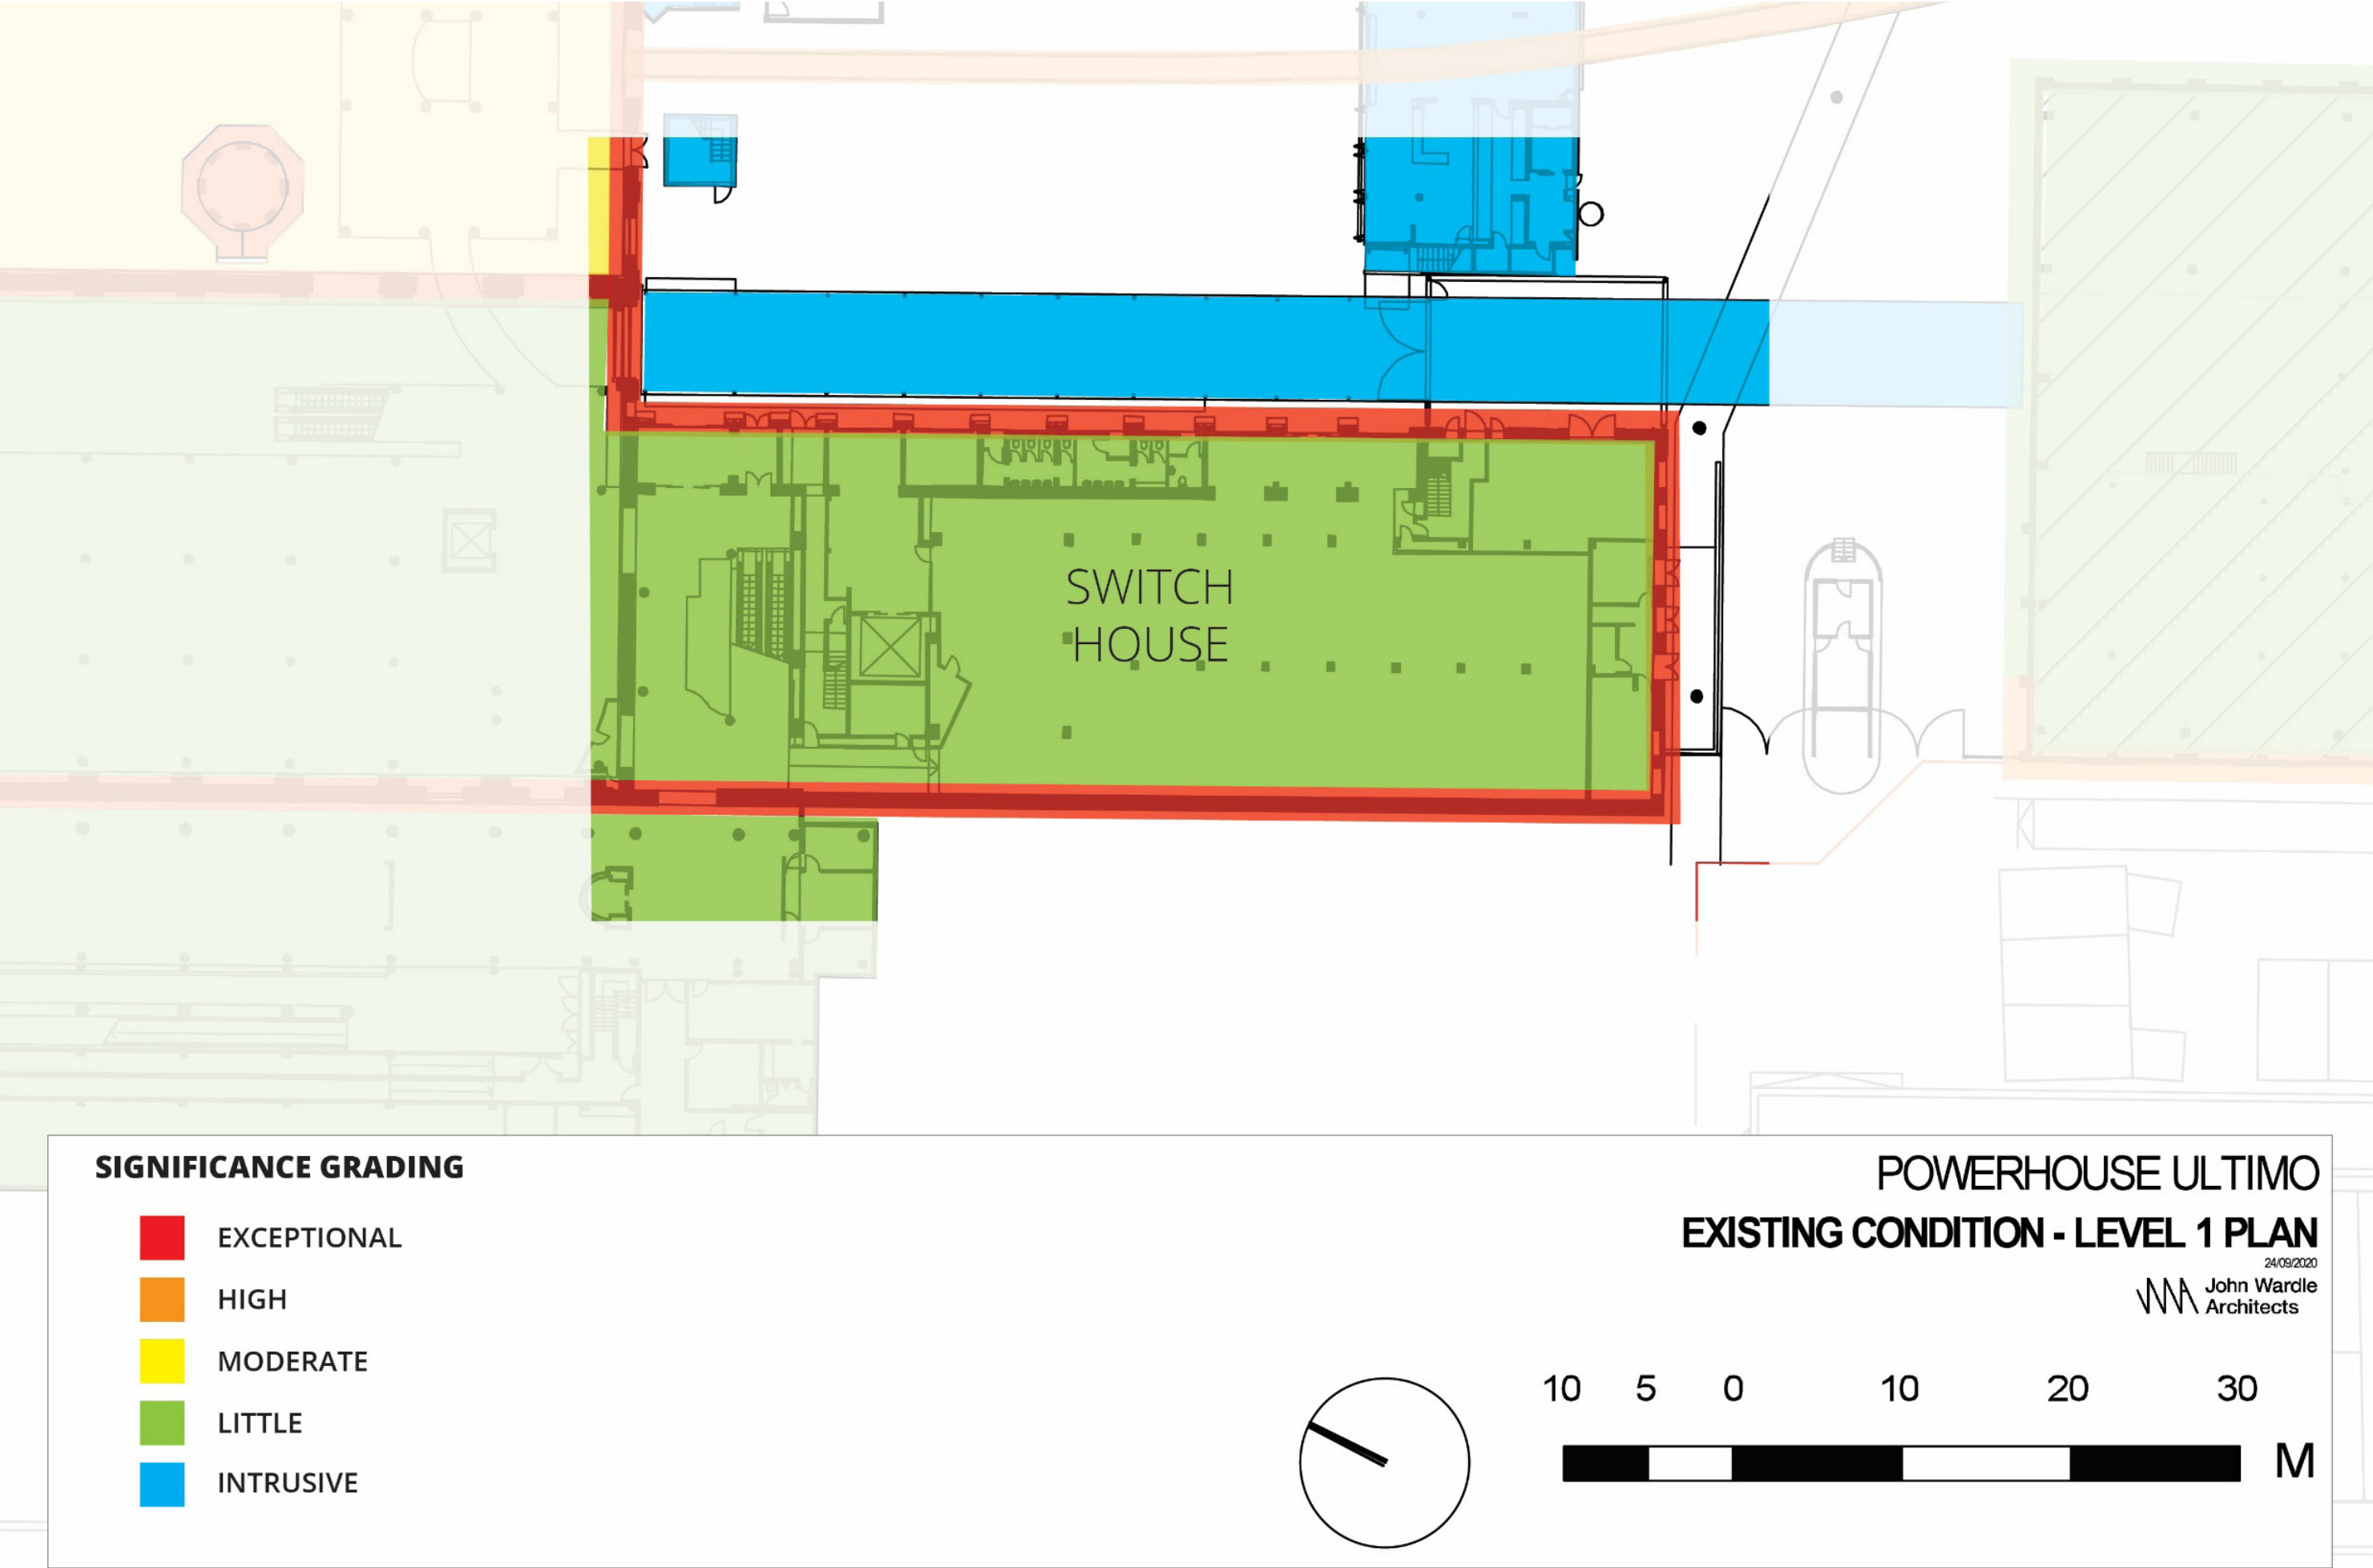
Switch House Grading of Significance (Level 1) (Source: John Wardle Architects plan with Curio Projects overlay)
